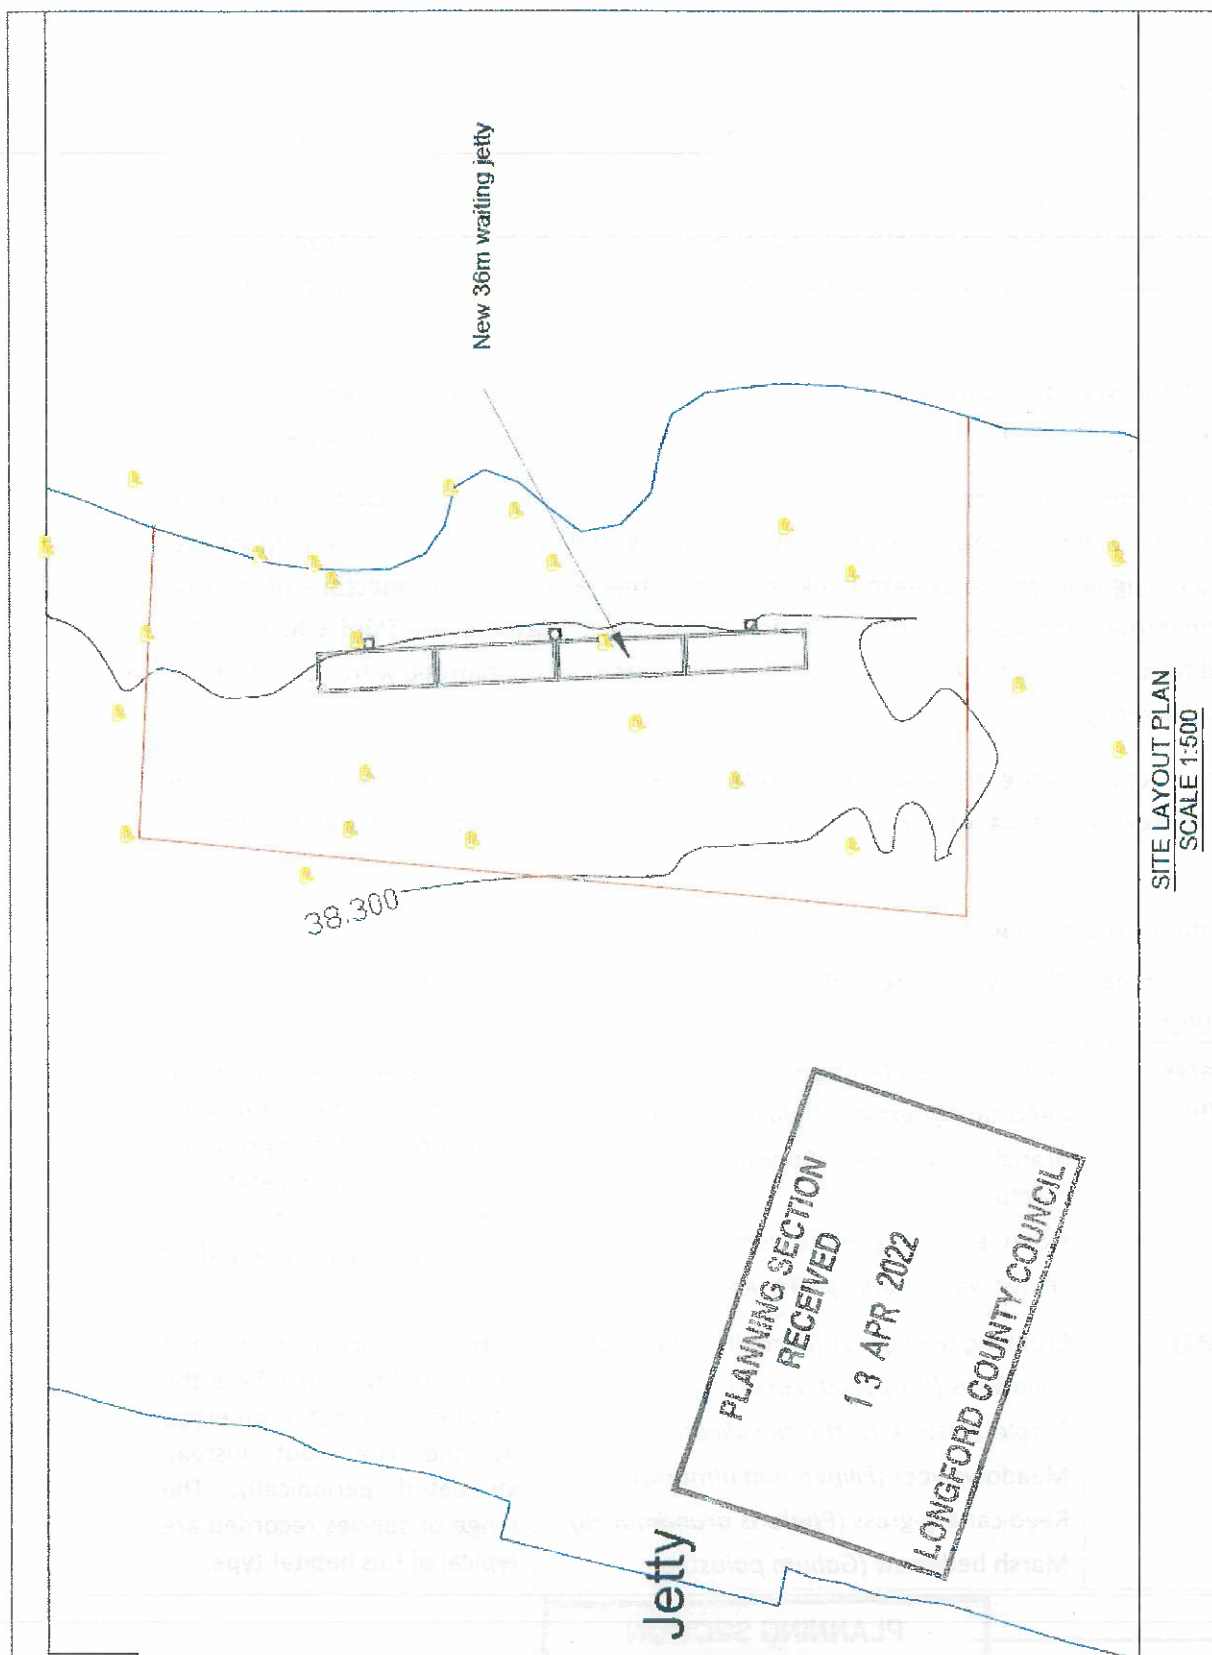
Site plan showing the existing jetty and proposed layout for new moorings.
